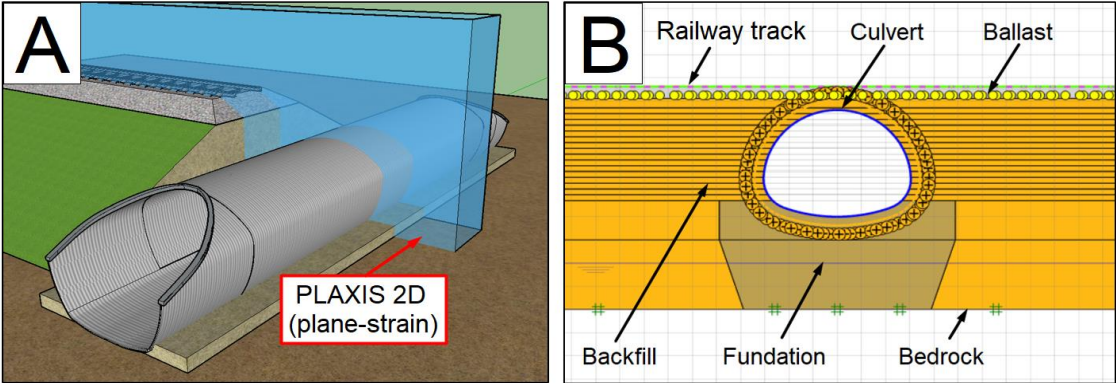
Principles of plane-strain when introducing a steel culvert into the system, showing A) a principal sketch of the culvert in relation to the railway structure and B) an illustration of an effective plane in PLAXIS 2D with designations
